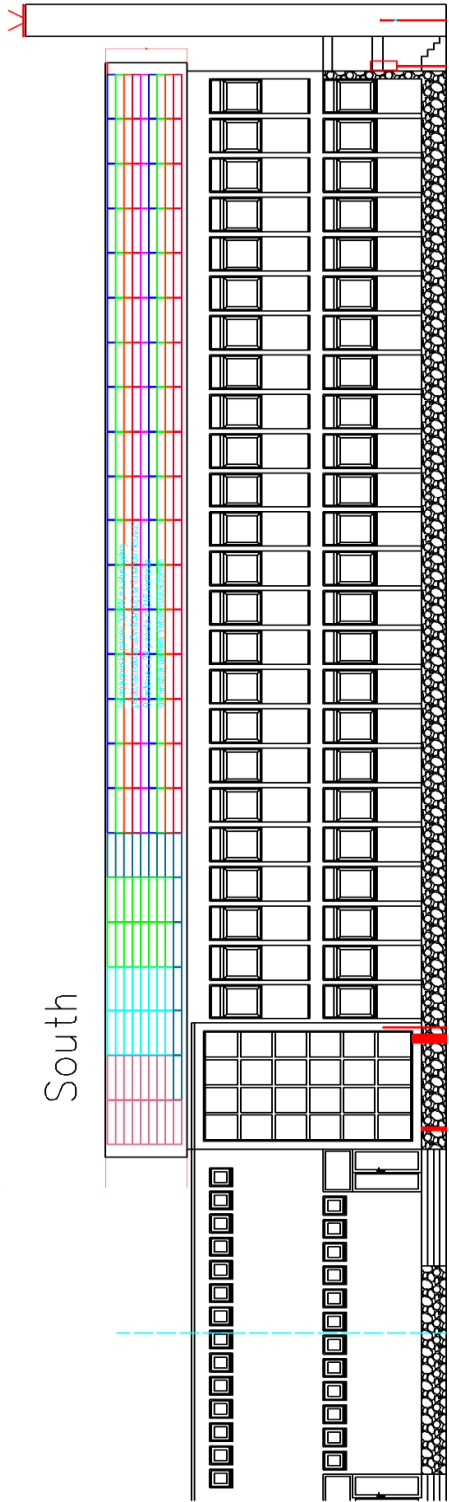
PV arrays of Photovoltaic power plant on UNISB building in I. Gundulić Street (front plan, south side)
